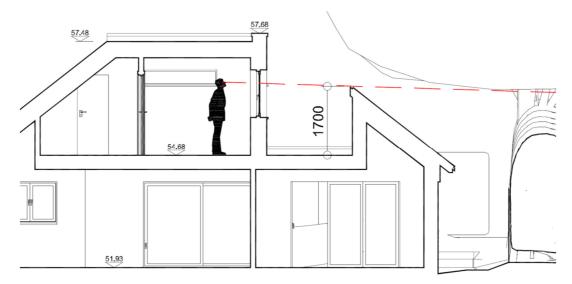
Section through bedroom and lightwell showing pitched roof blocking views to 1.7m high
